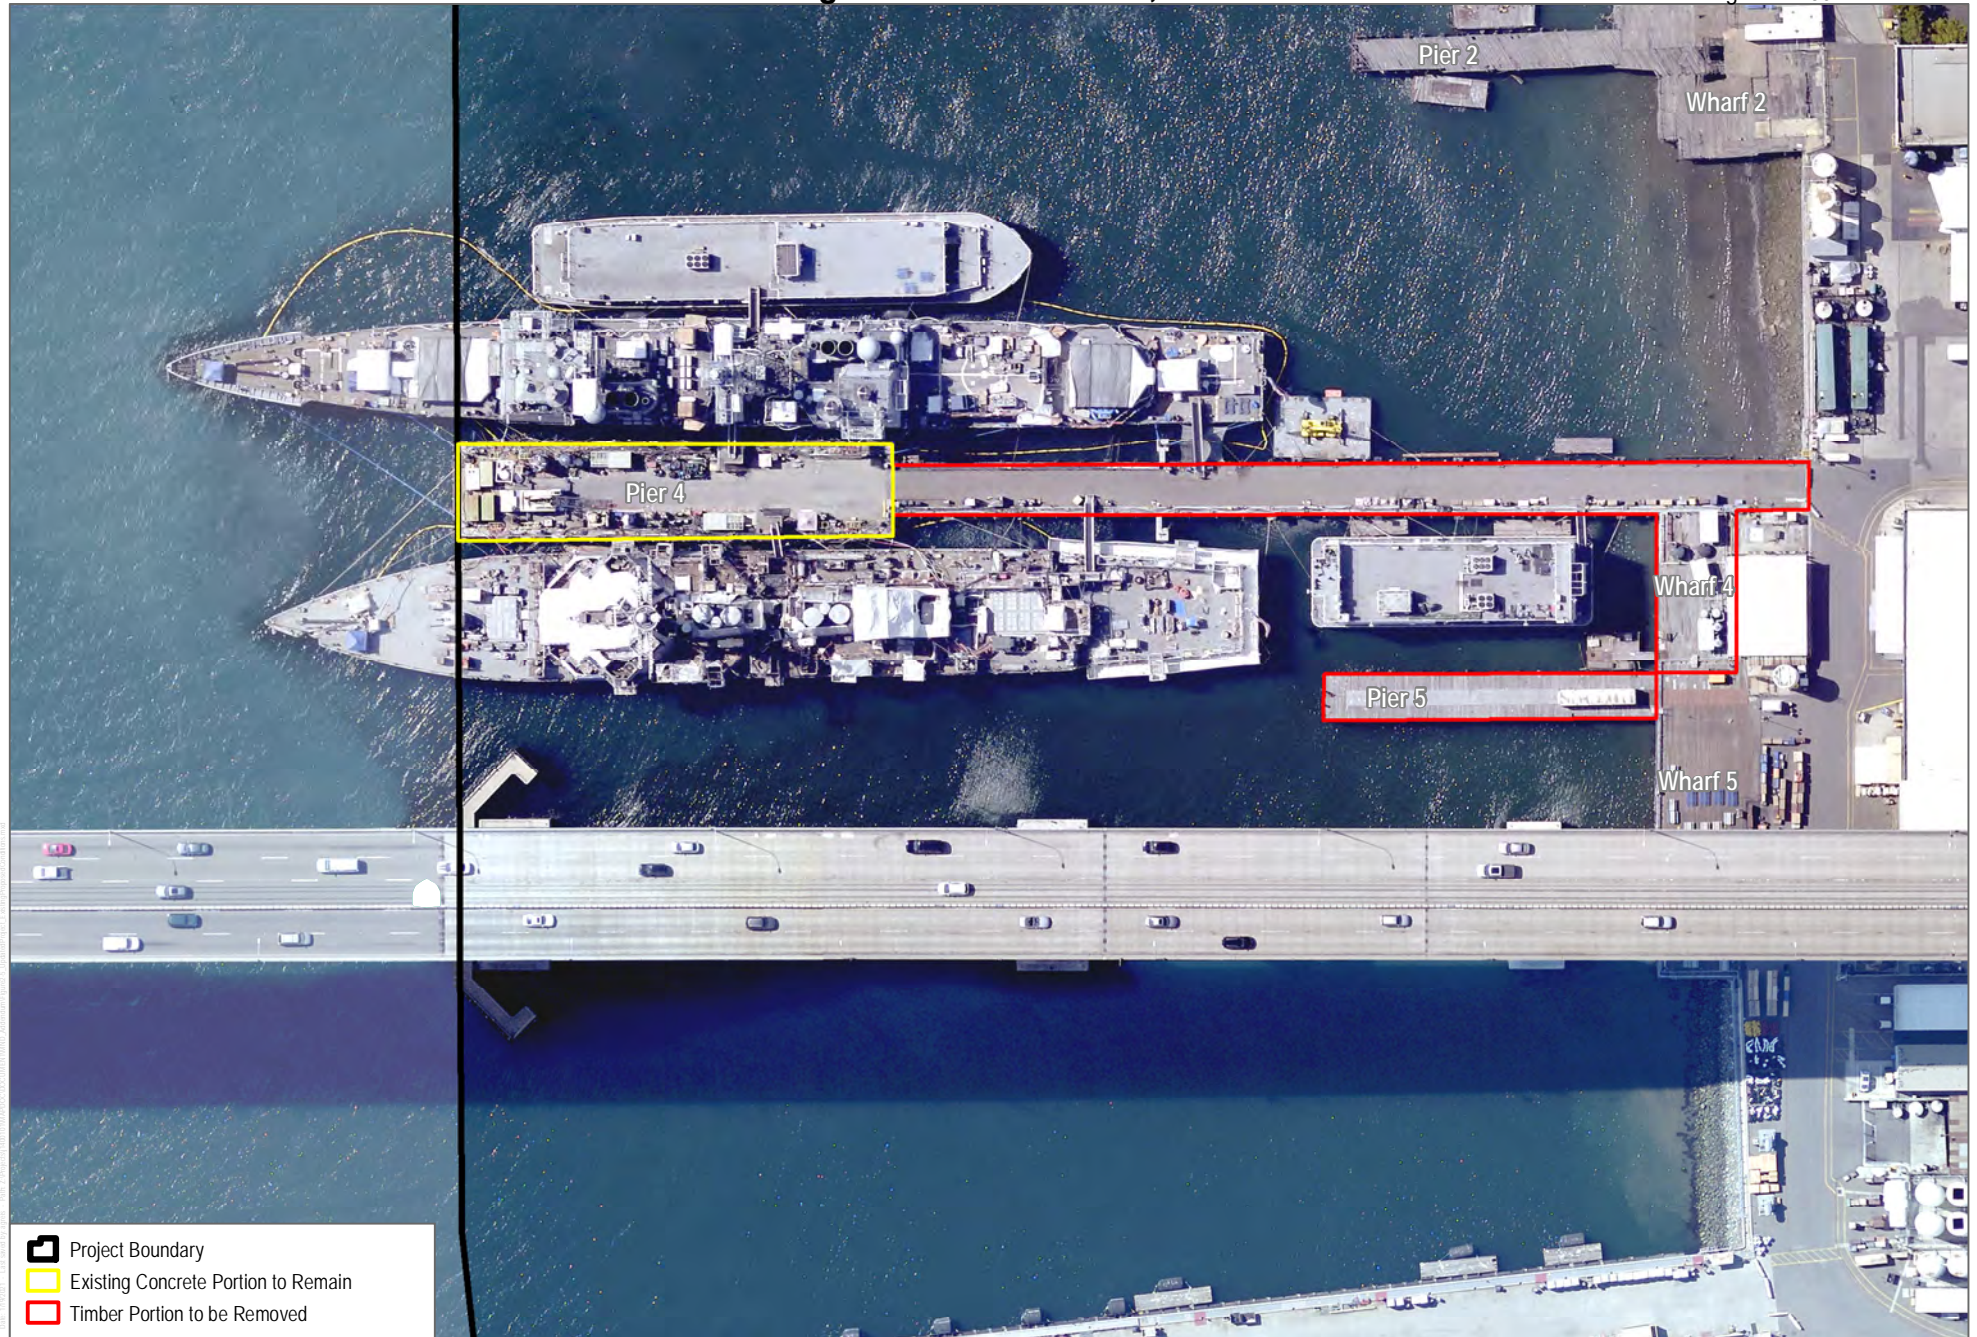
Existing Conditions of Pier 4, Wharf 4 and Pier 5
